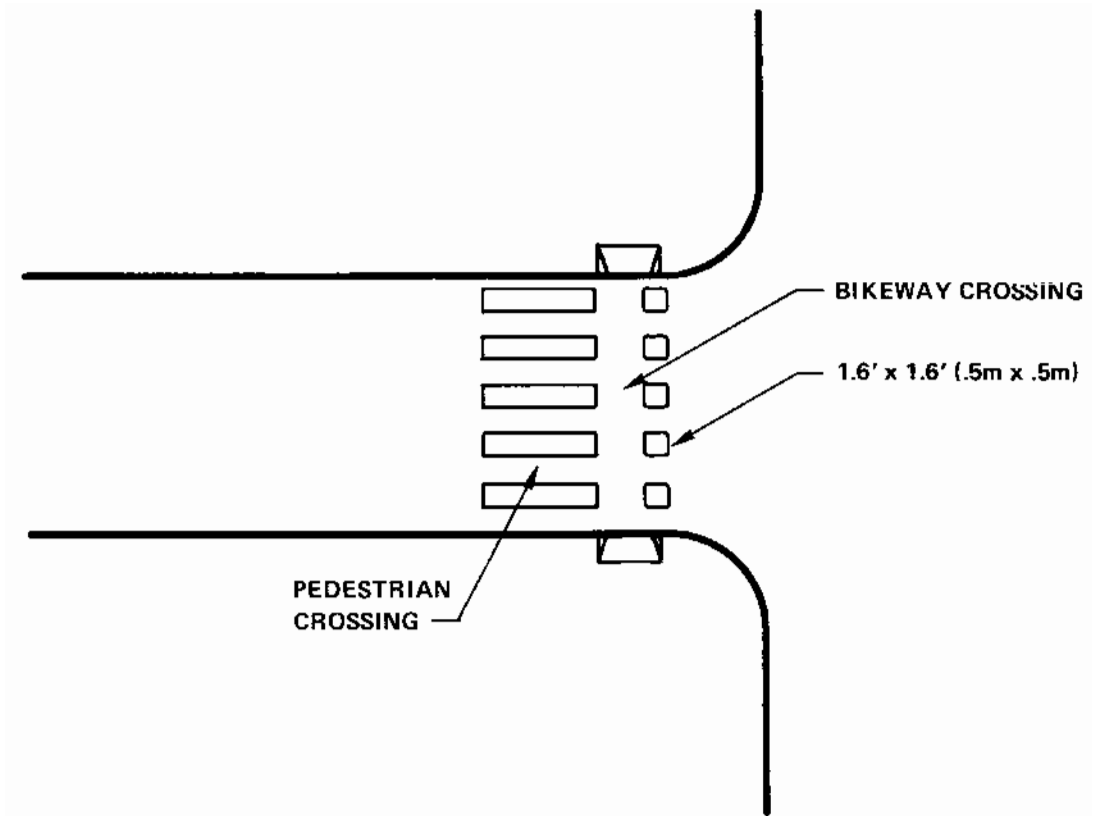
Recommended Bikeway and Pedestrian Crossing Markings [Ref. 26]
